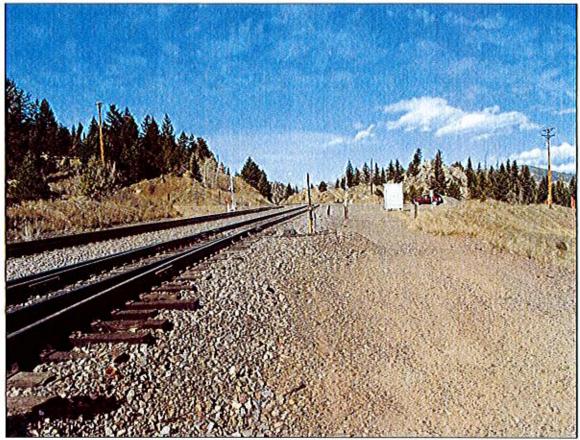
West P.S. House Track 136# RE No. 10 TO (looking West)
